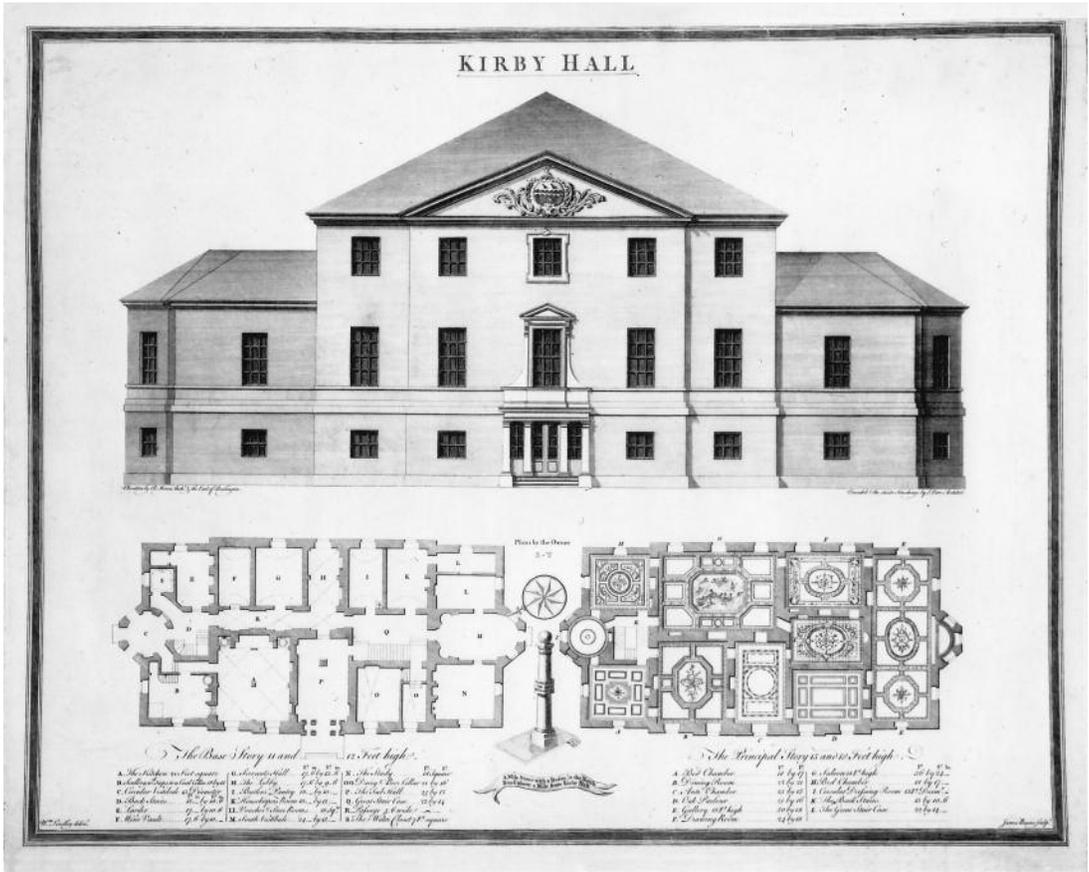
Kirby Hall, Little Ouseburn, elevation and plan. (*British Library*)
